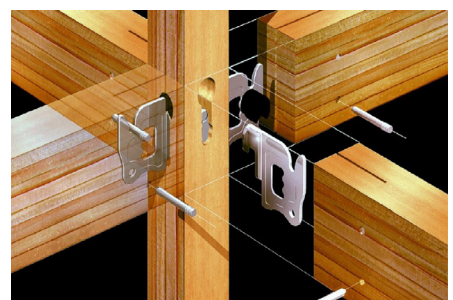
Reversible steel 'STRUCTUREZ' connections (Woodinc, n.d.)
